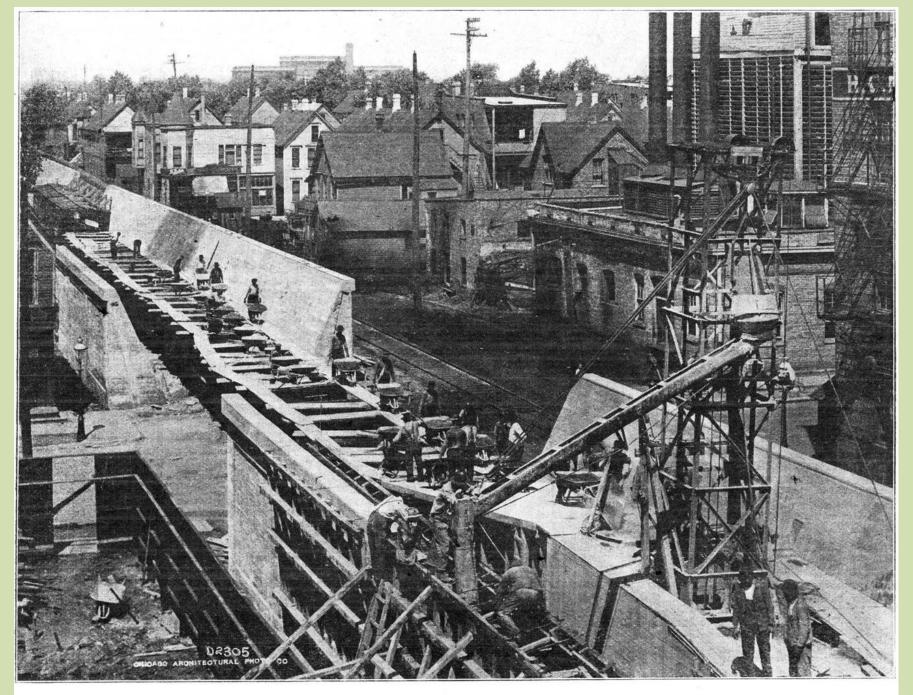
Concrete Plant with Tower Distributor, C., M. & St. P. Ry.
